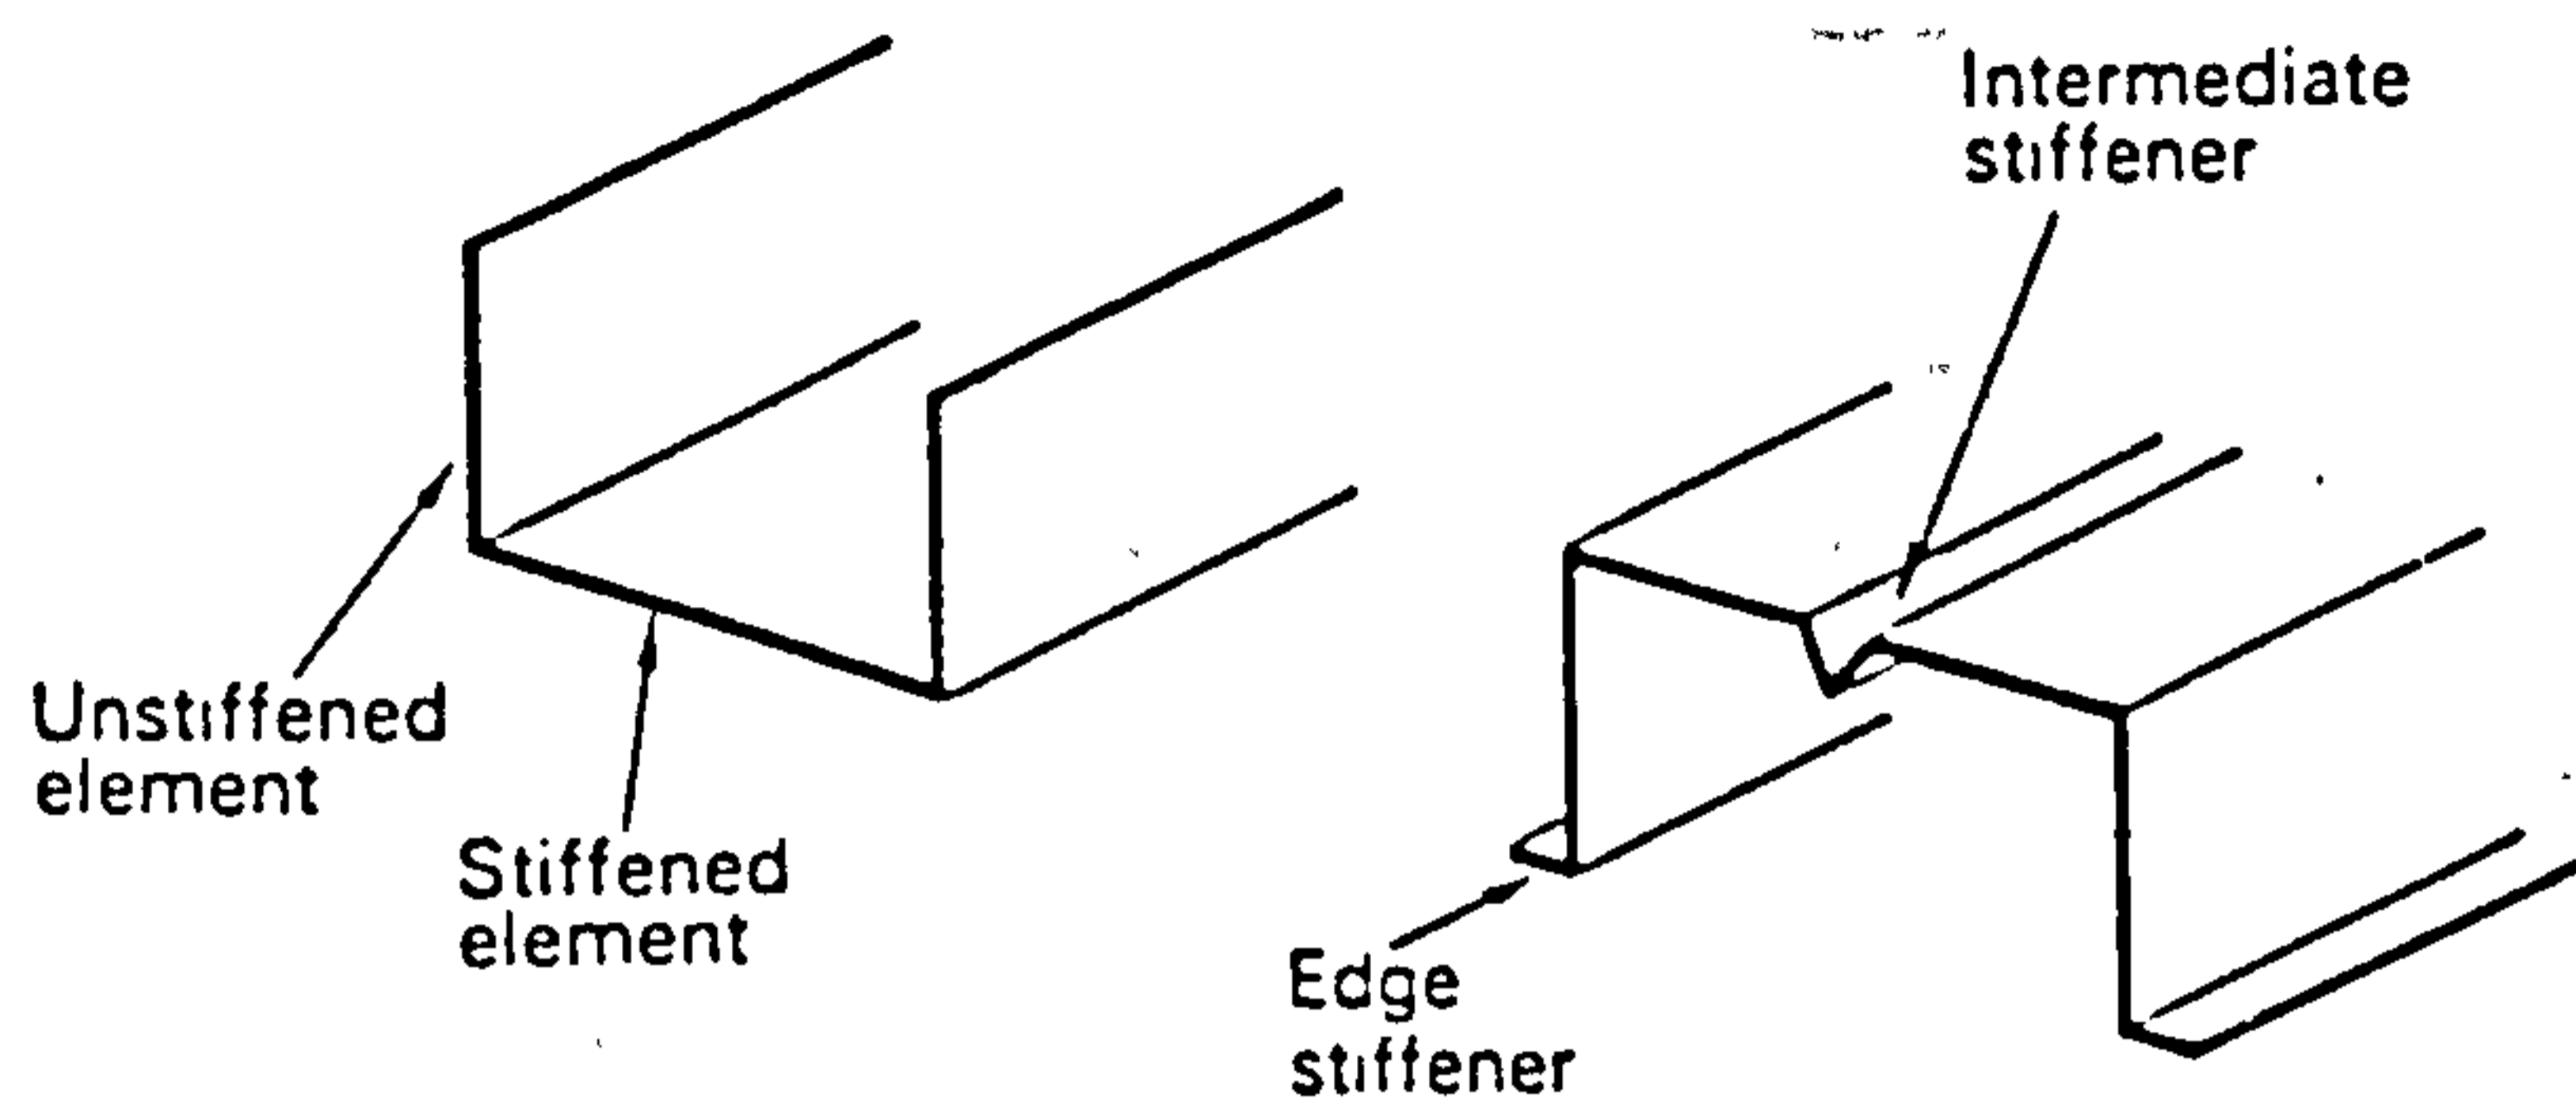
Typical Elements of Cold-Formed Sections
